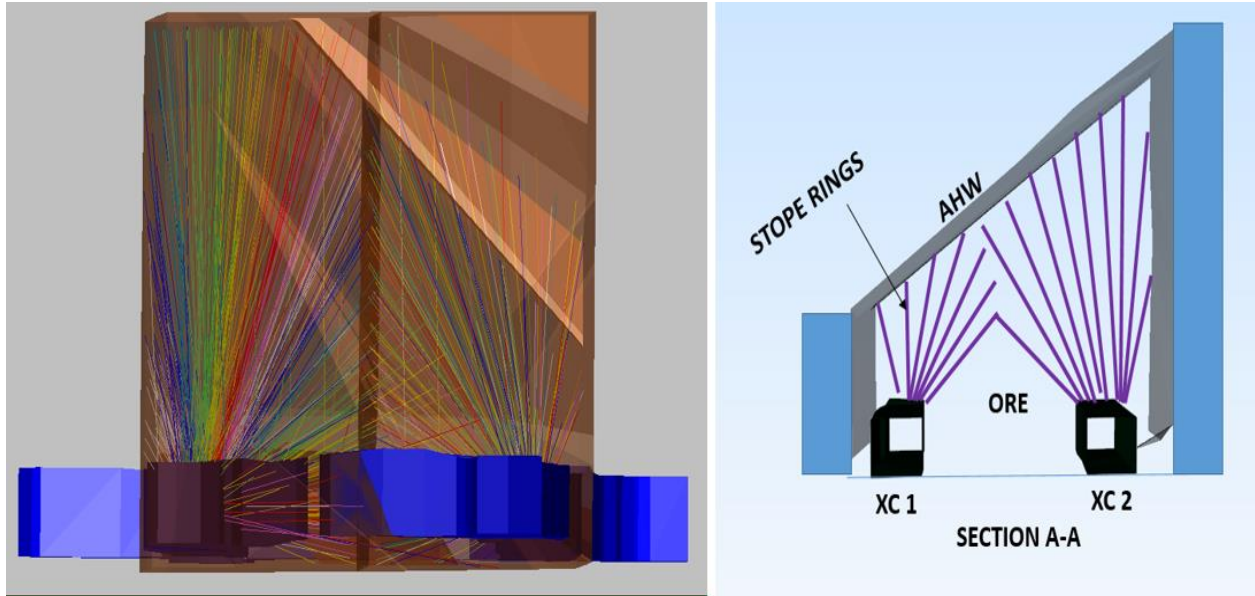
Sections showing upward holes, slot and ring design of folded ore body.
